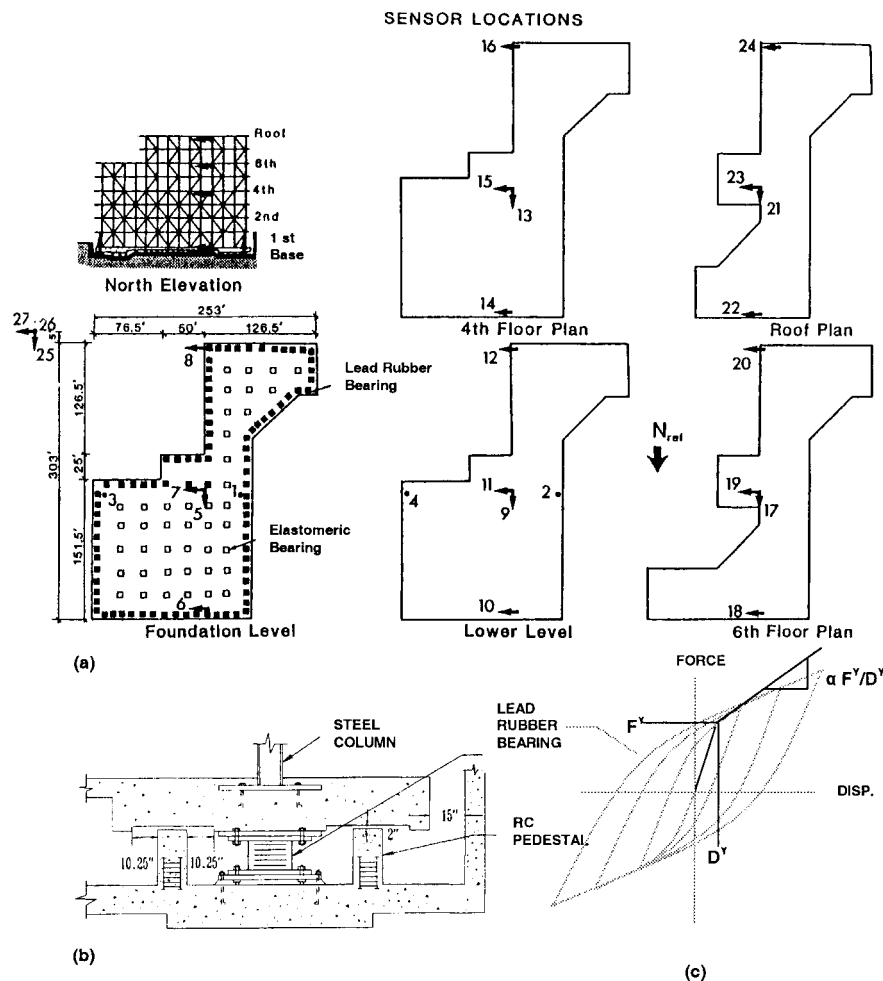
USC Hospital Building (1 ft = 0.3048 m; 1 in. = 2.54 cm): (a) Elevation, Plan, Sensor Locations; (b) Isolation System Details; (c) Smooth Bilinear Hysteretic Force-Displacement Loops of Lead-Rubber Bearing
